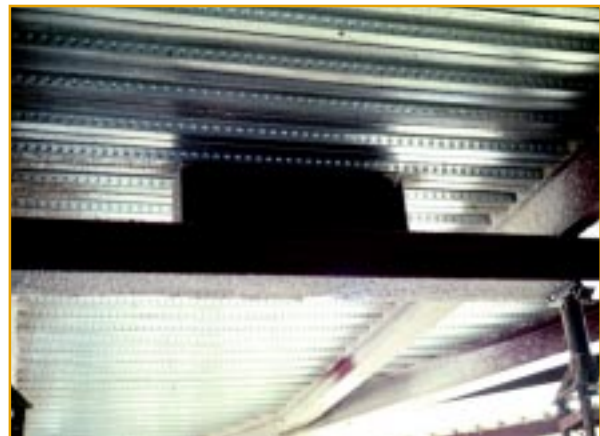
Stub girders consist of a universal column section as a bottom chord and a concrete slab as a top chord. ©The Steel Construction Institute.
